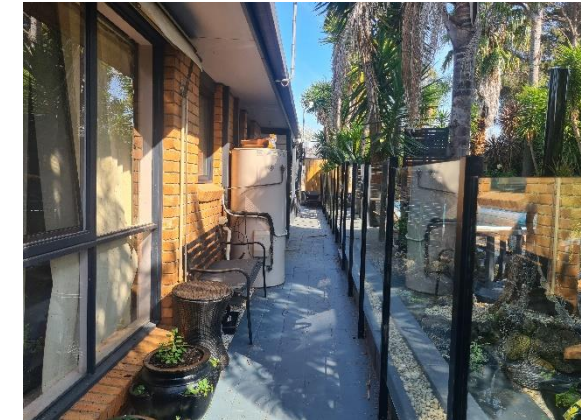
Existing access at 4 Counihan Street, Wy Yung being access to proposed Lot 3.
